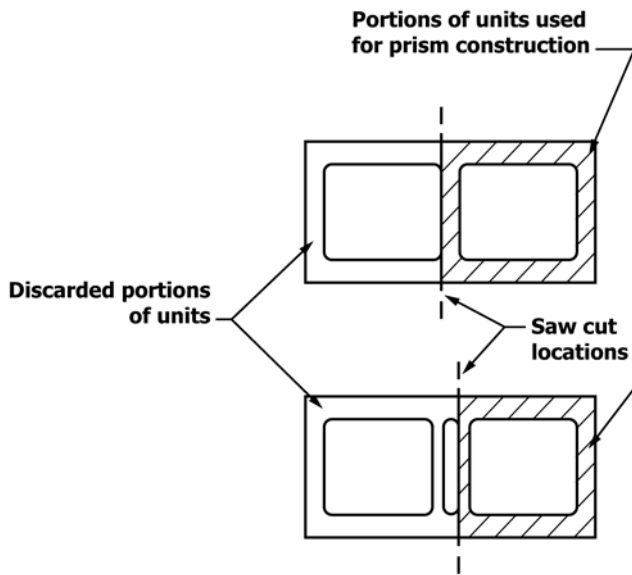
Reduction of Hollow Units Prior to Prism Construction
